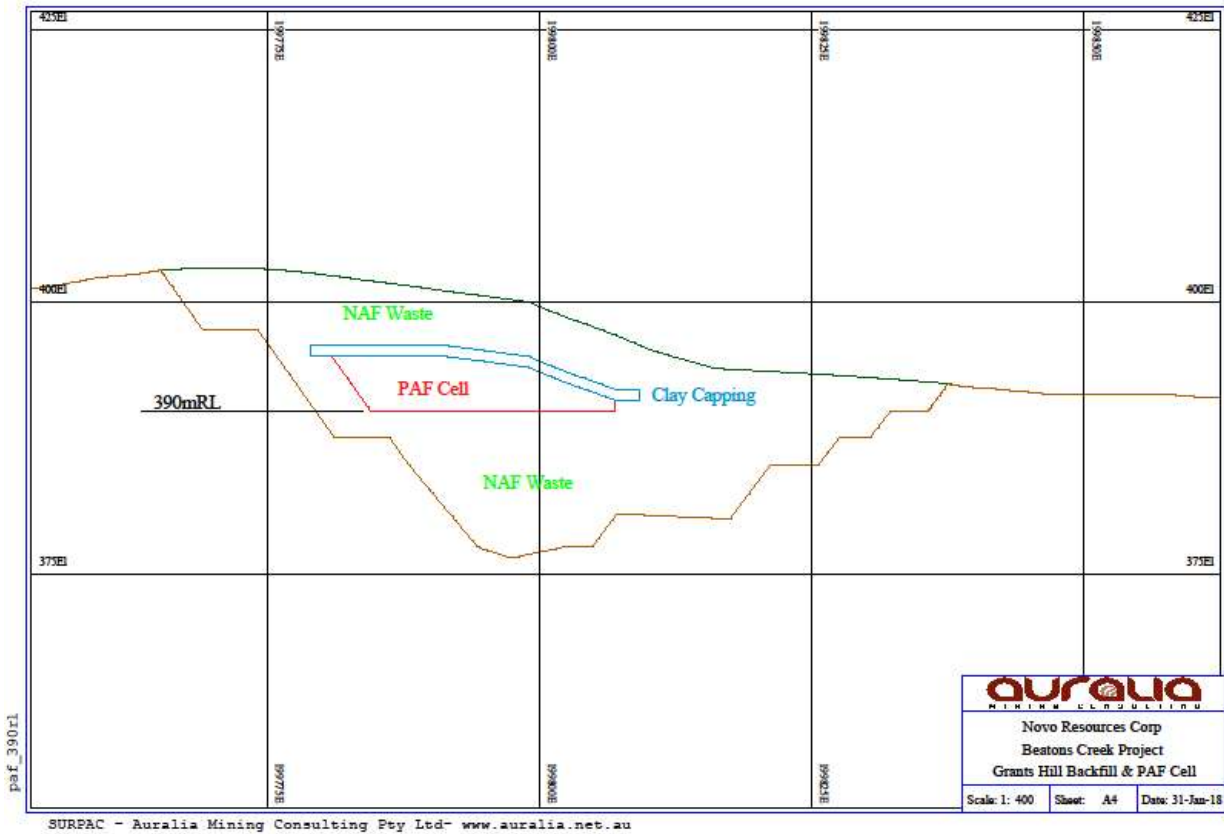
Typical Backfilled Pit Cross Section (South PAF Cell)
